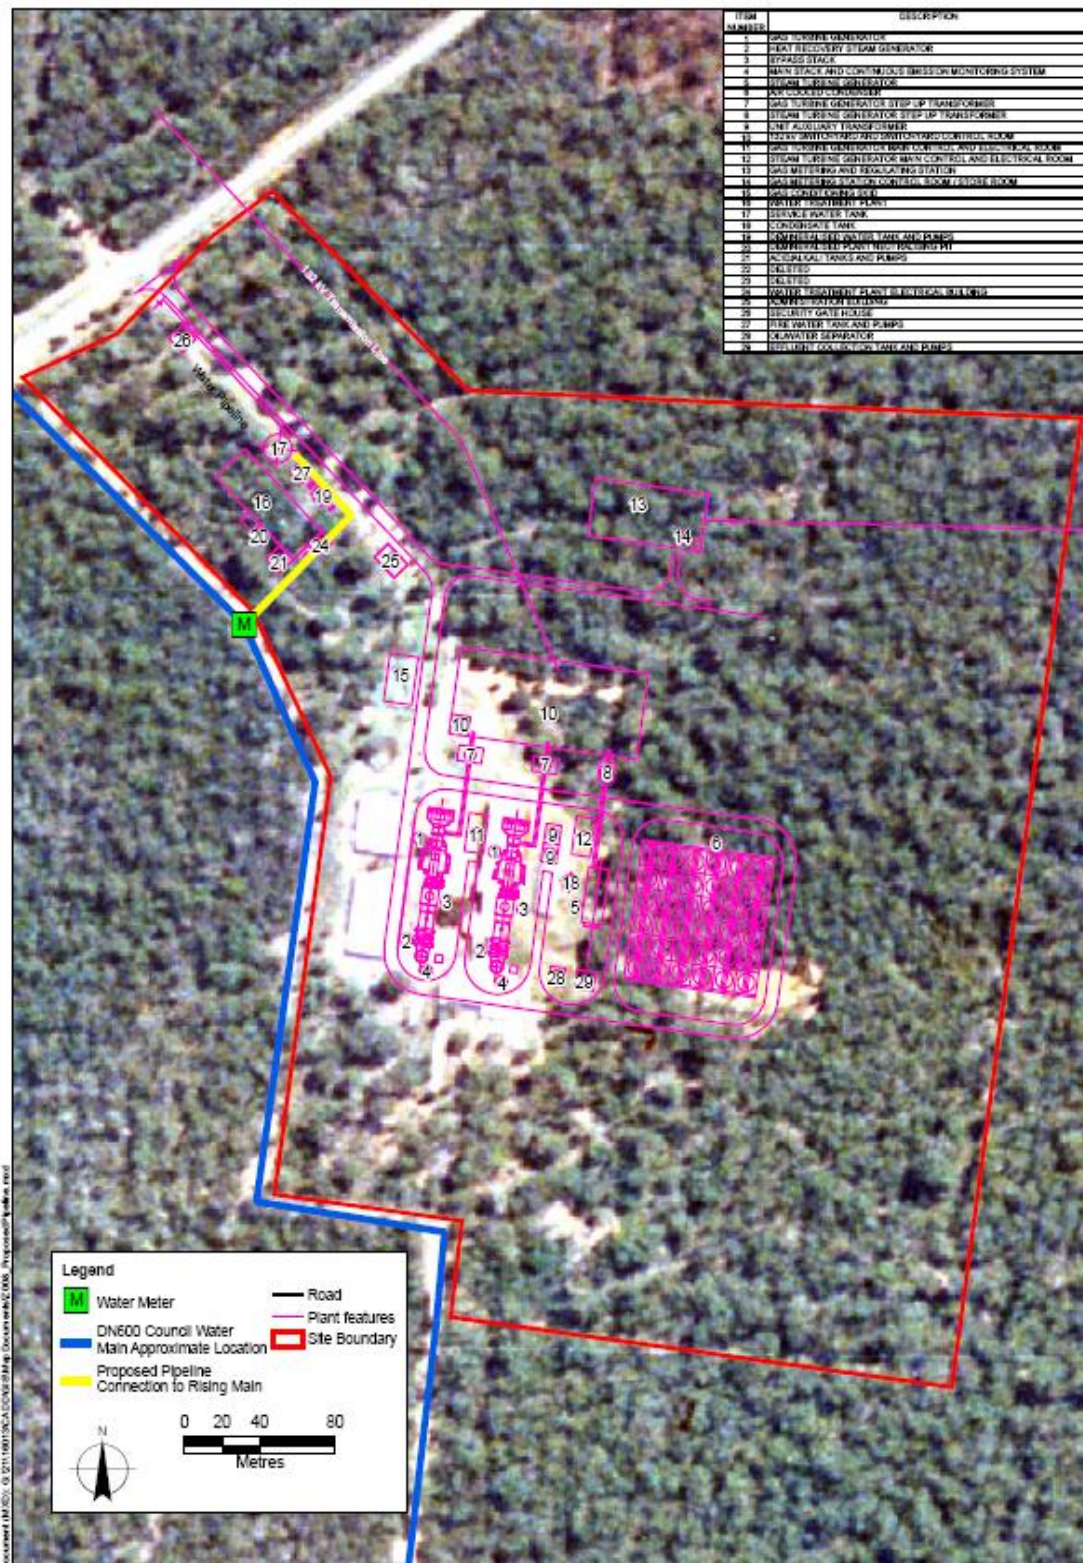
Proposed pipeline route for connection to DN 600 Hobas Rising Main
